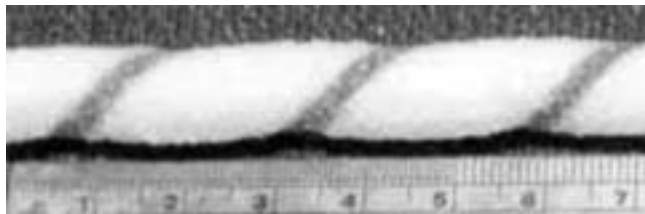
E-glass/vinylester GFRP reinforcing bar with helical tow.
